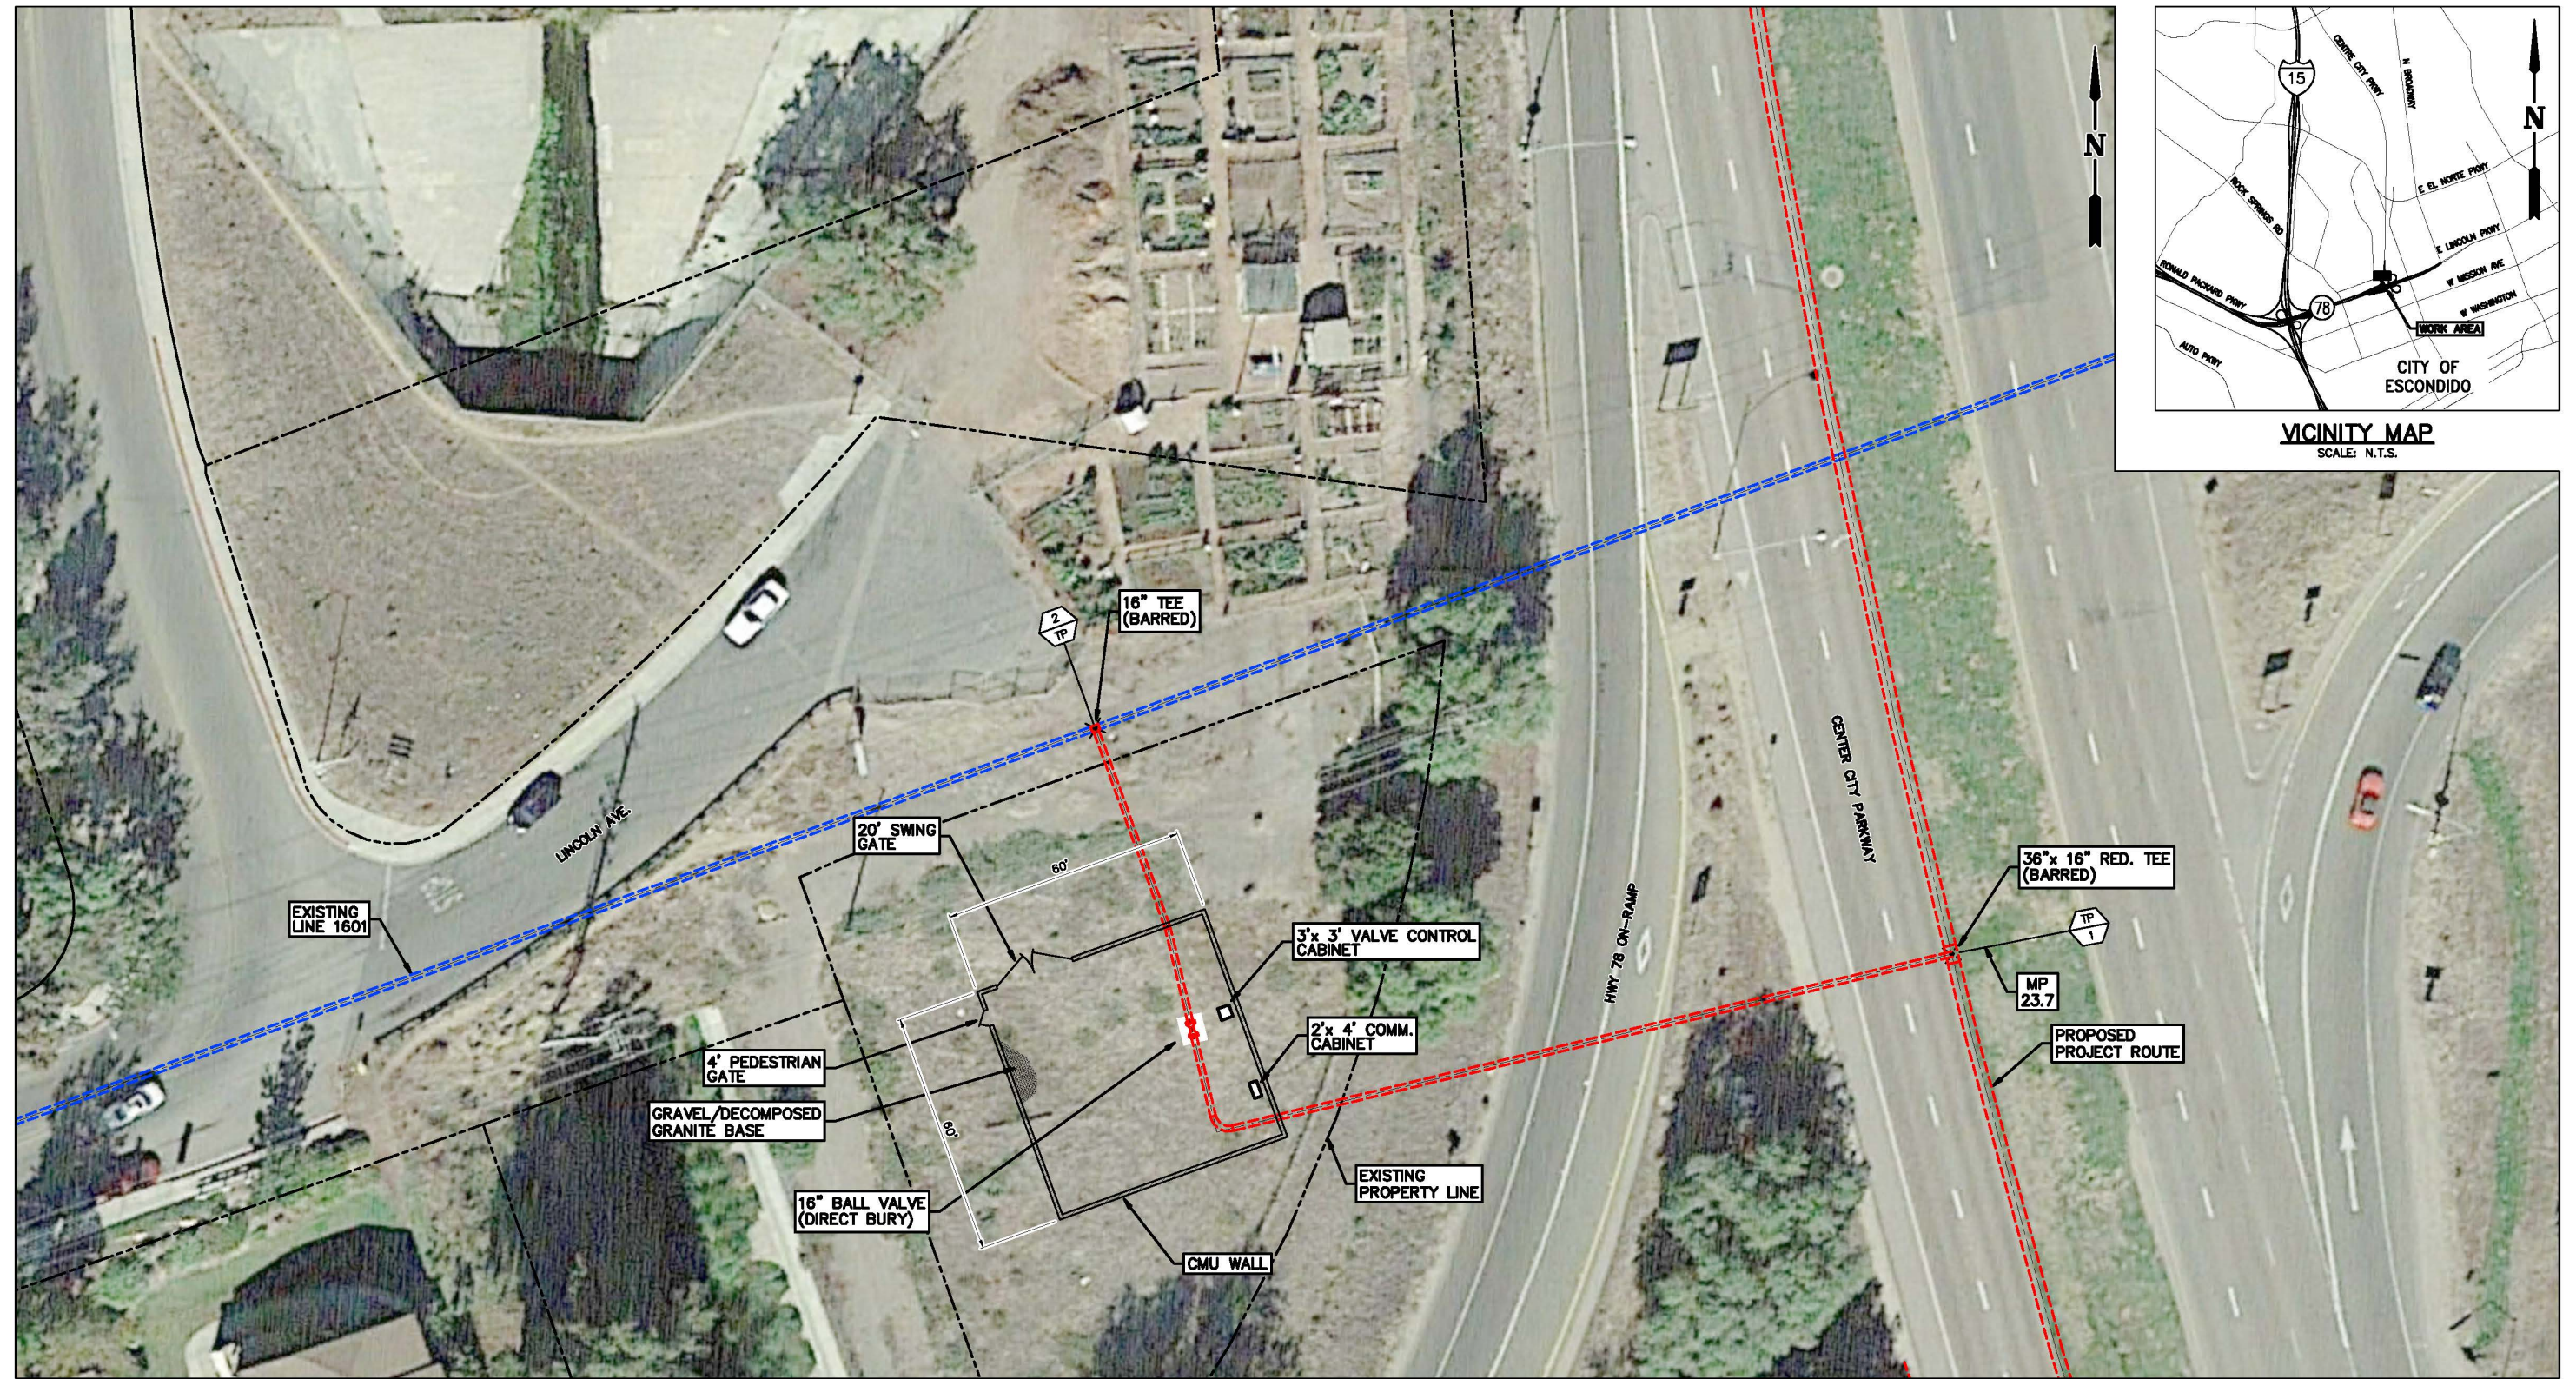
Line 1601 Cross-tie Site Plan
